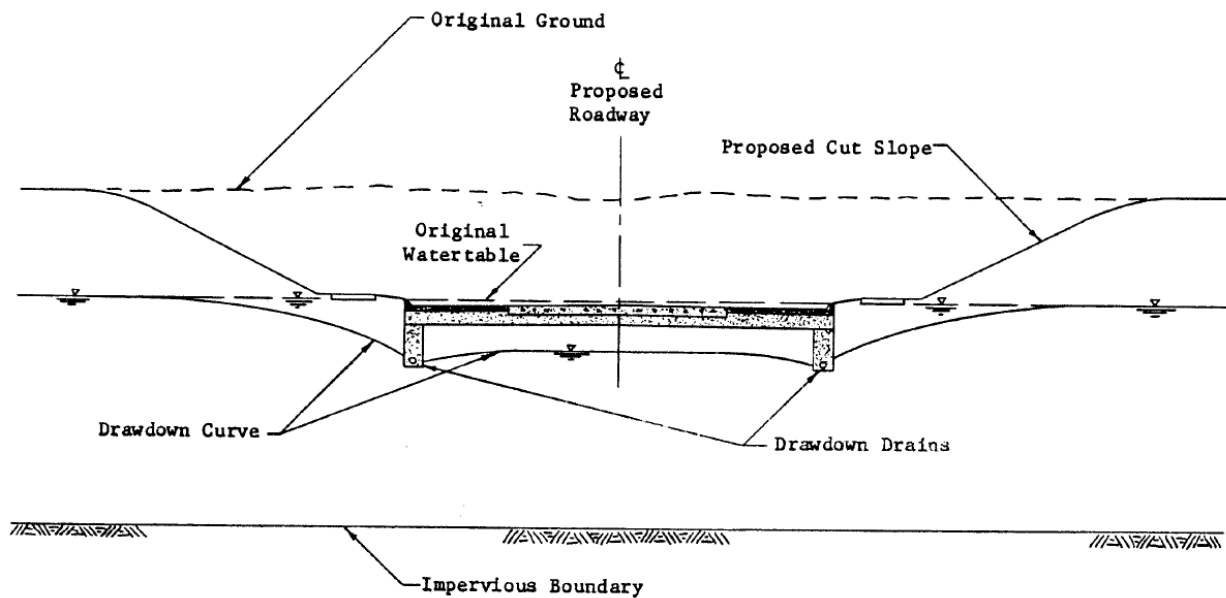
Symmetrical longitudinal drains used to lower the groundwater table and to collect water infiltrating the pavement (Moulton, 1980).
